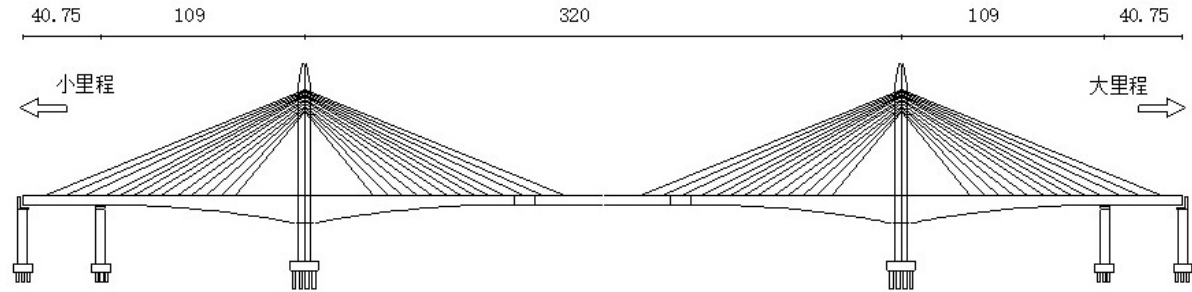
General arrangement of high-speed railway hybrid beam extradosed bridge (unit: m)
